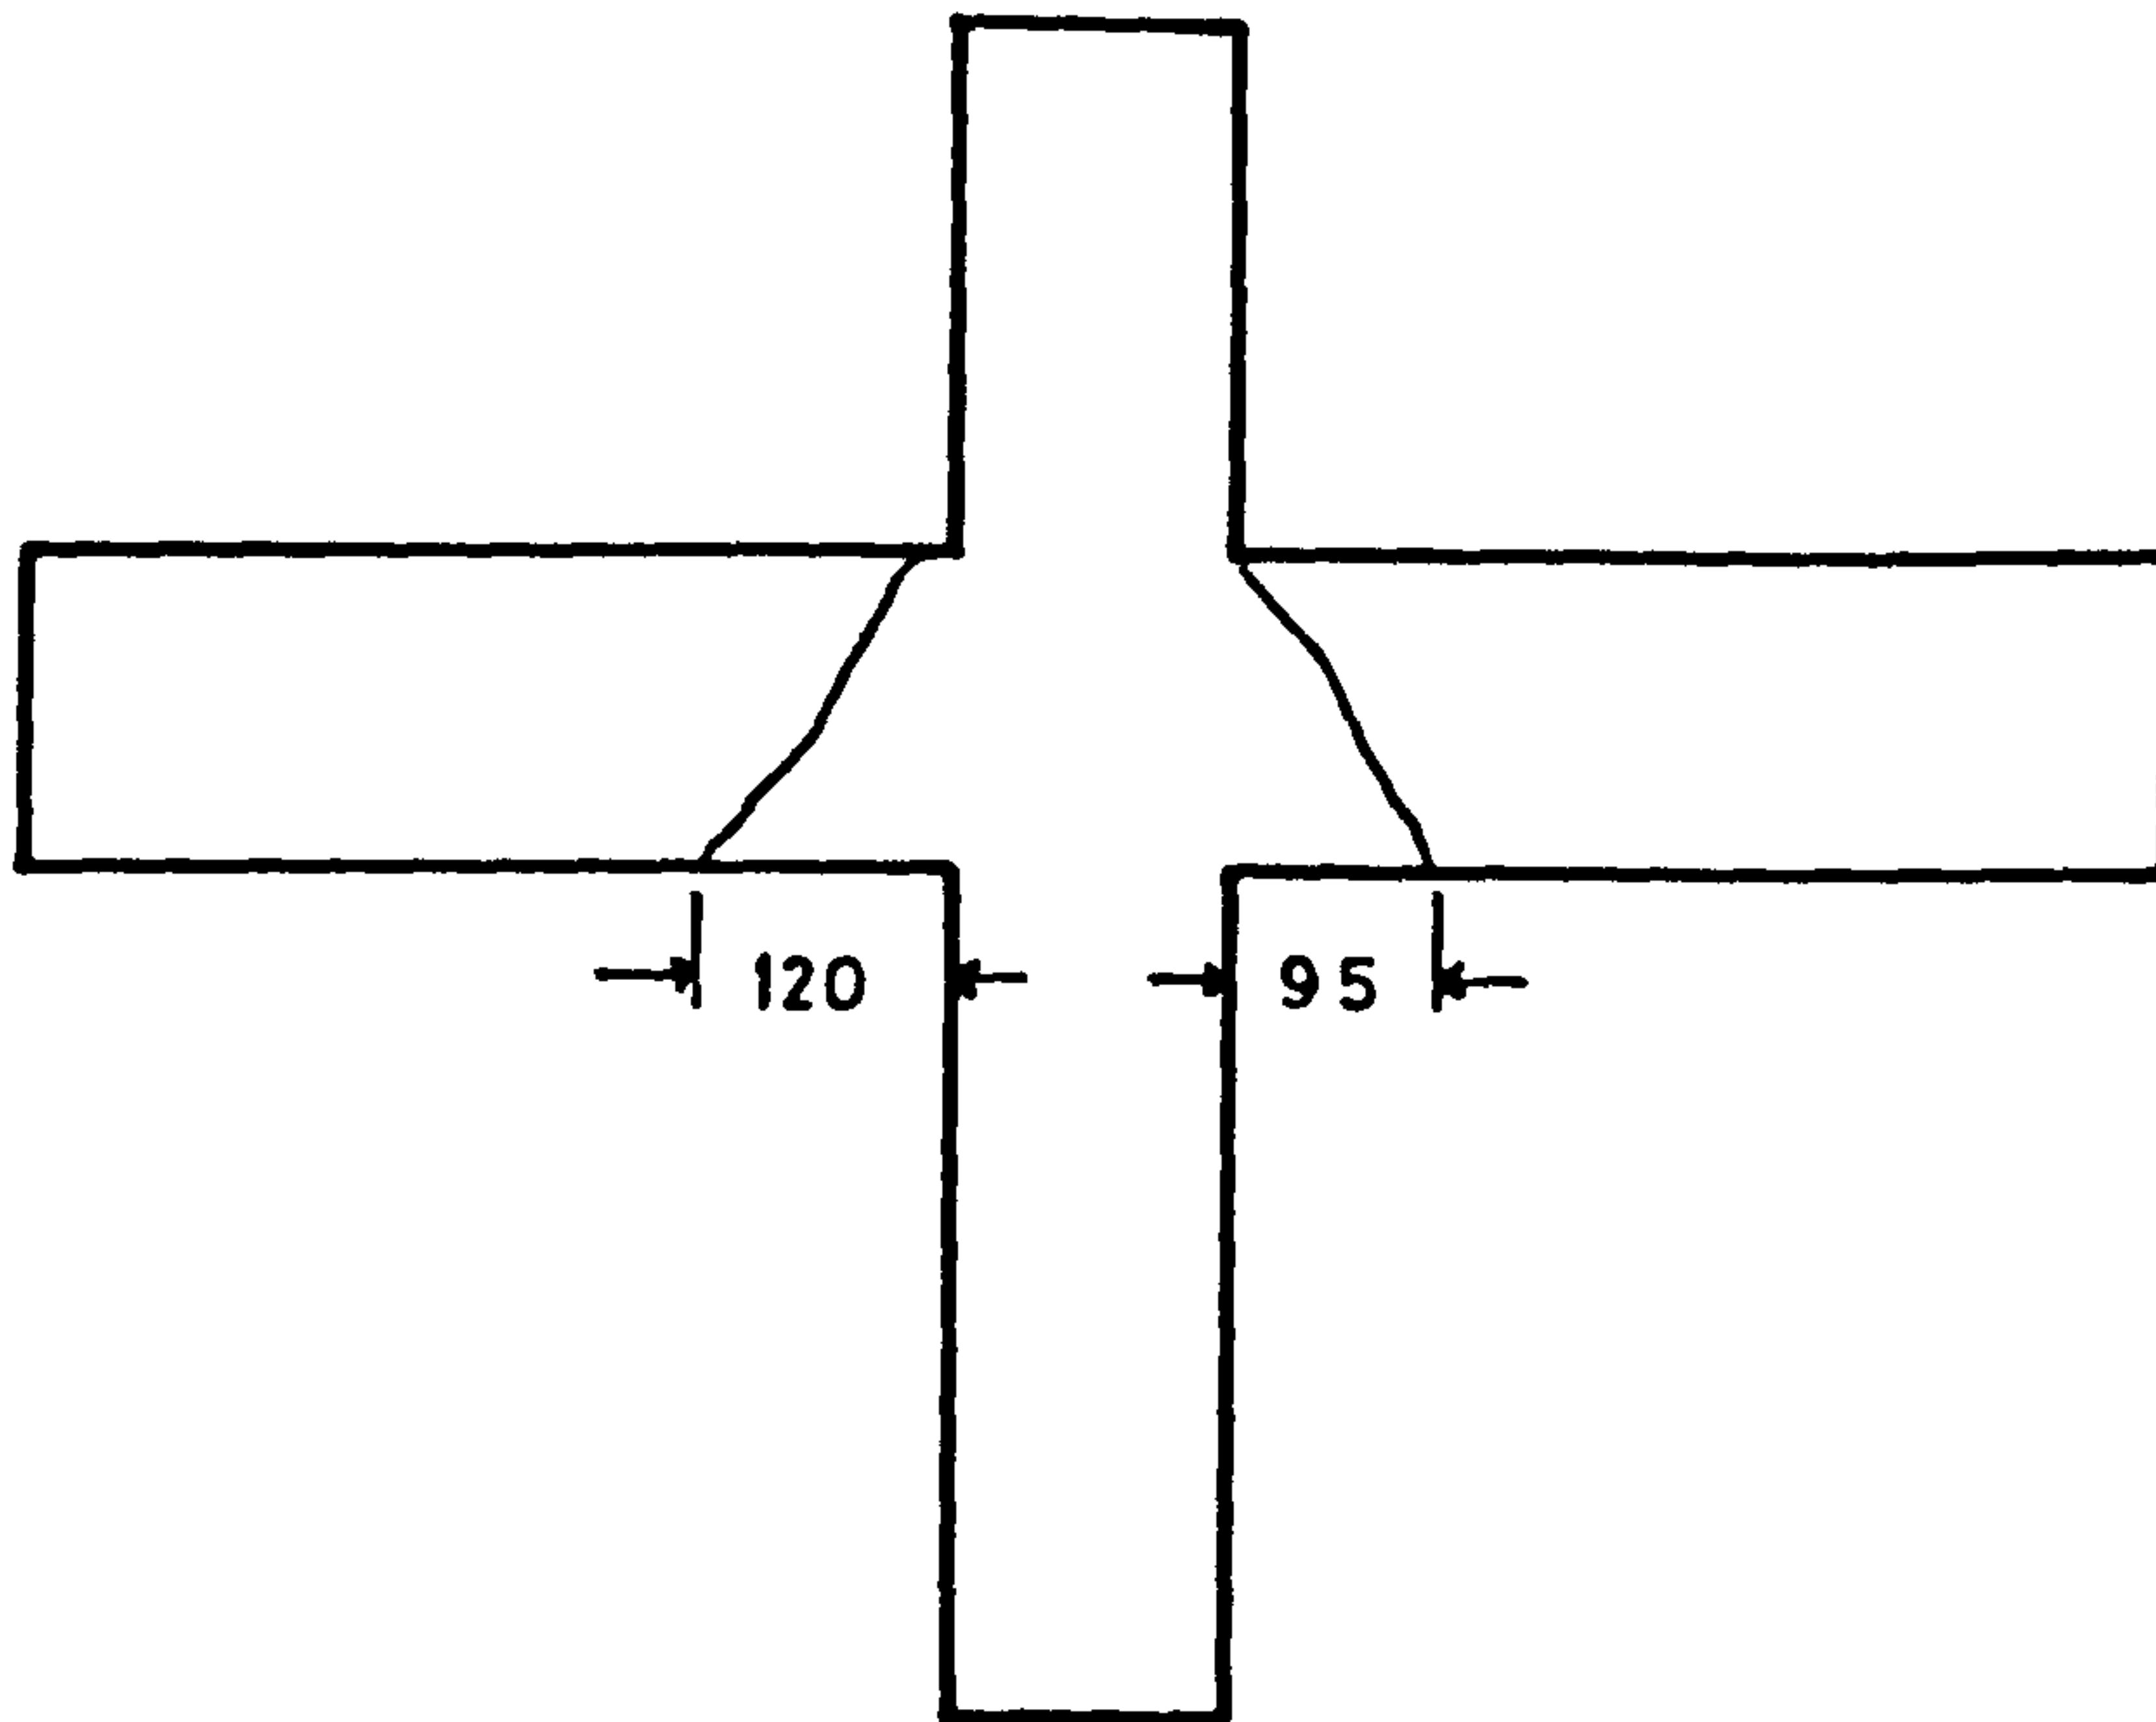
Shear cracks in the slab at the back of model MT8.
